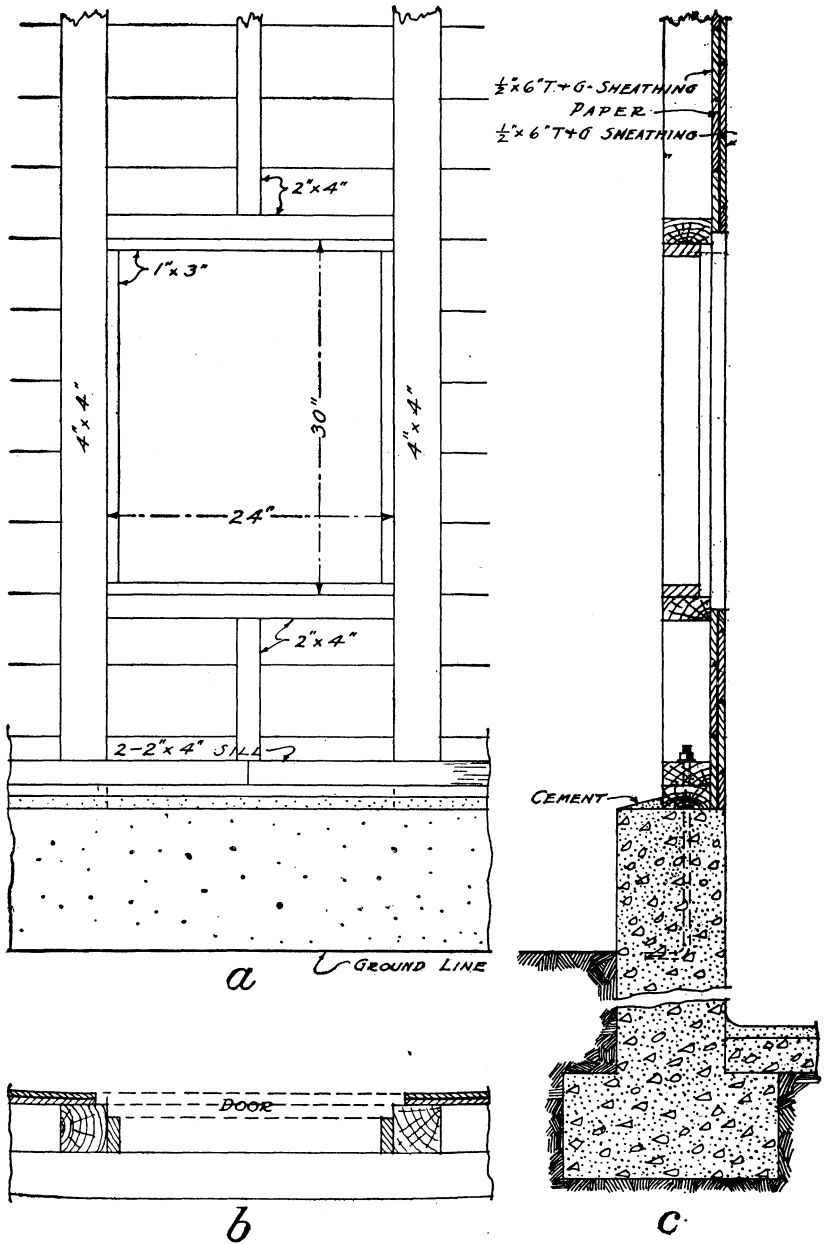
Details of construction of modified Wisconsin silo: *a* and *b*, details of door opening; *c*, sectional view of foundation and wall.
